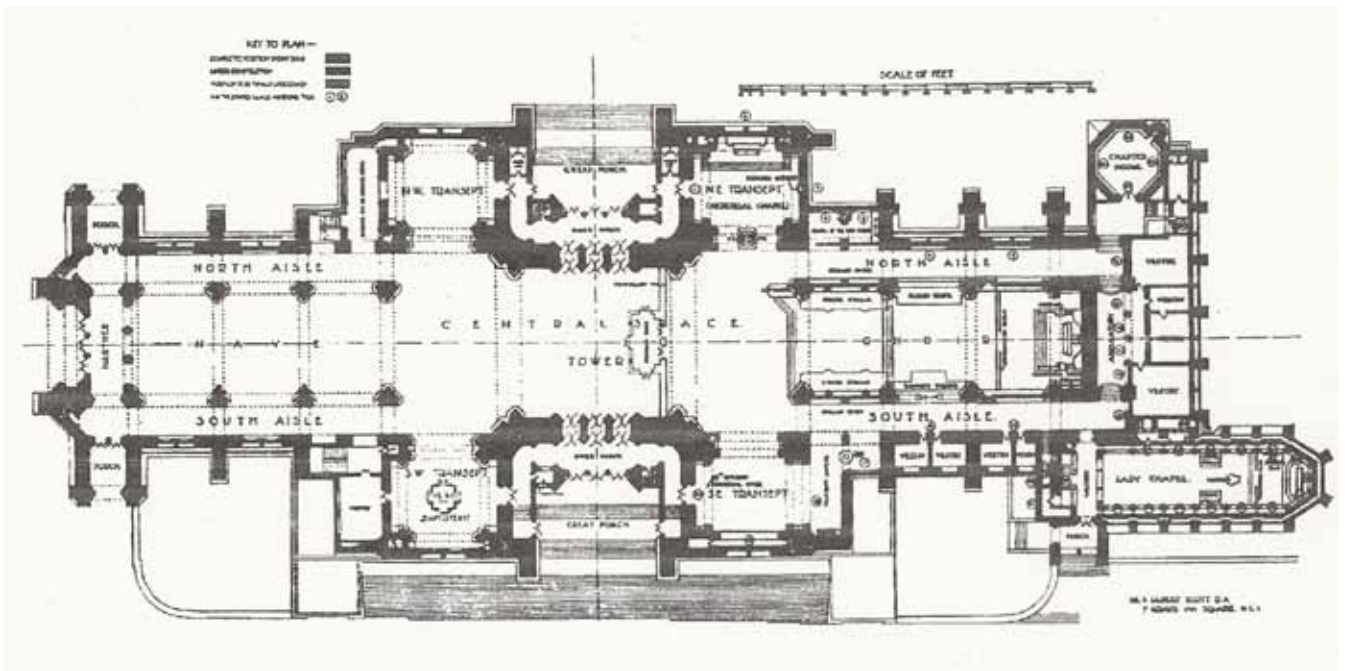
Plan of Liverpool Cathedral as built. Author's Collection.
